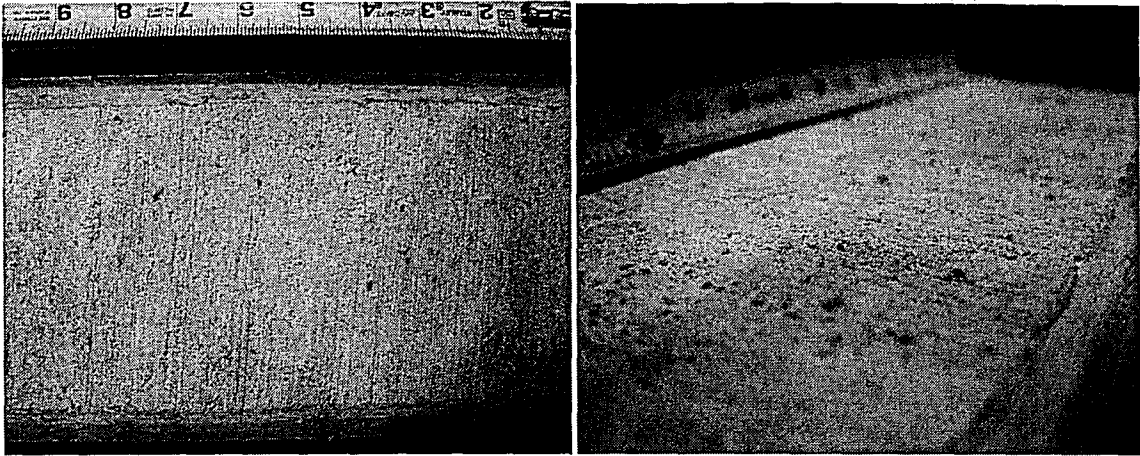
Broom Surface Finish [Specimen 6B6]
